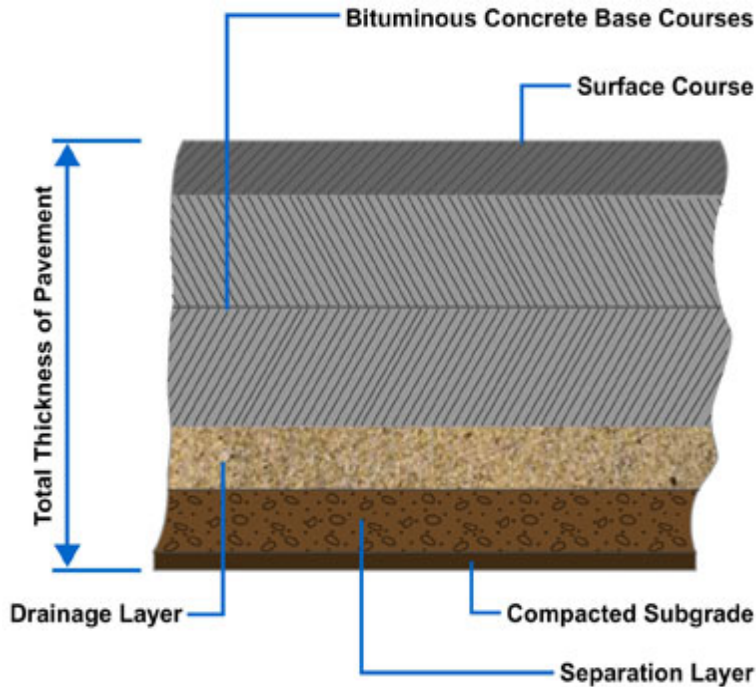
shows a typical all-bituminous concrete pavement. However, UFC 3-26-02, *Pavement Design for Airfields* does not recommend this type of pavement for Navy airfields.
